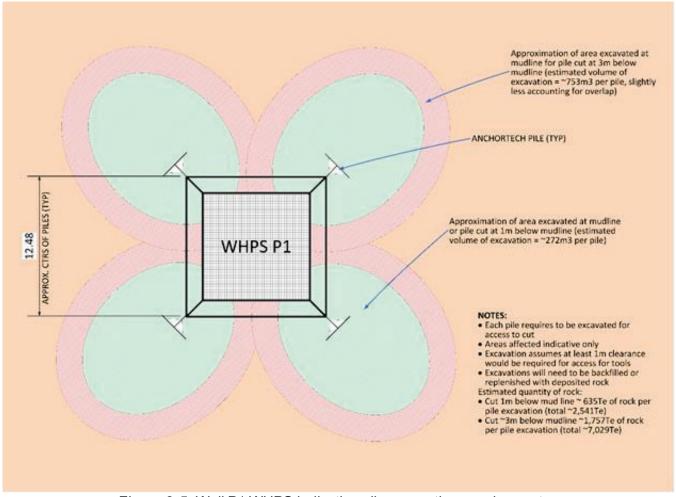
Well P1 WHPS indicative pile excavation requirements.
